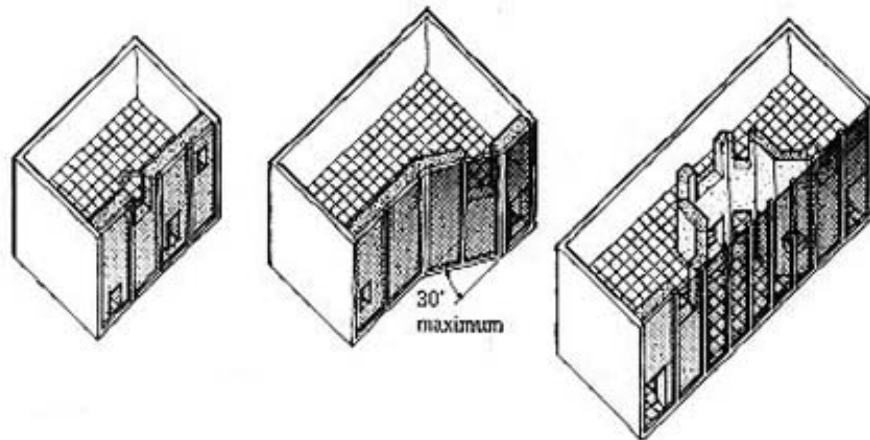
Trombe walls can be designed to fit virtually any south-facing wall.
